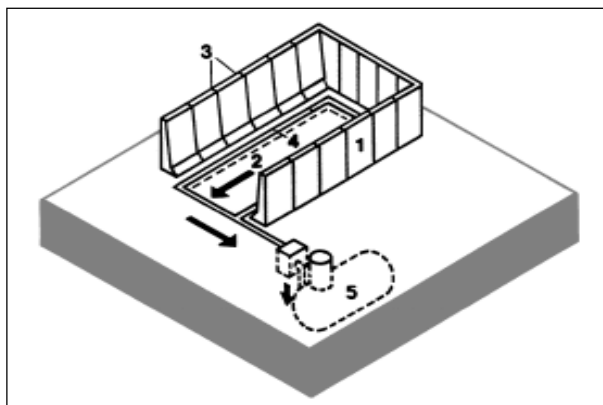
Scheme of the collection of leakage from silo: 1 - silo for ensilage, 2 - concrete, 3 - seals packed with pitch or mastic floor (concrete or bituminous), 4 - tray for the collection of silage effluent, 5 - tank for the storing of the leached silage effluent.
